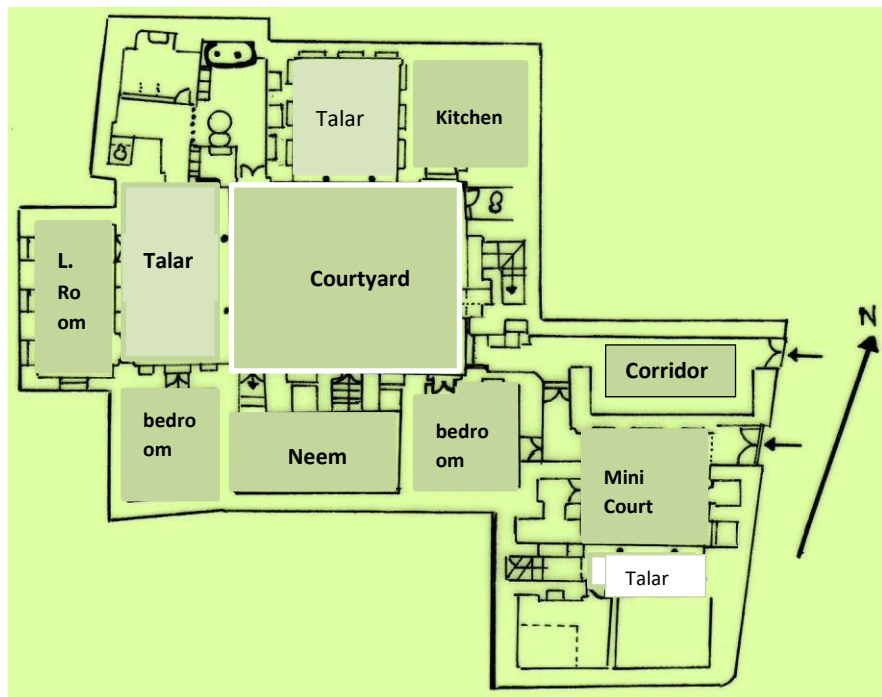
Ground floor level plan of traditional courtyard house No. 4. Scale: 1:50
